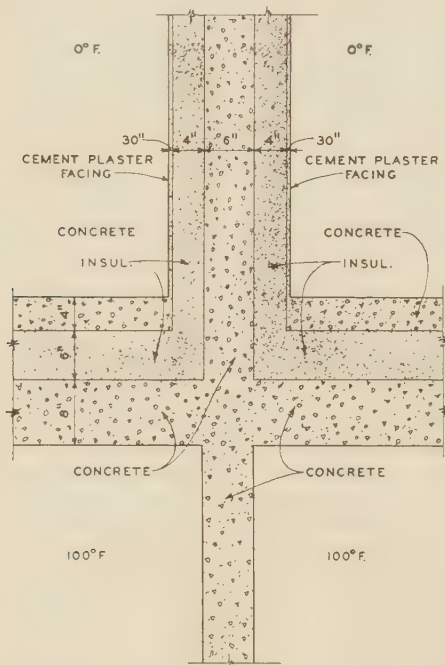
CROSS SECTION OF BUILDING STRUCTURE
